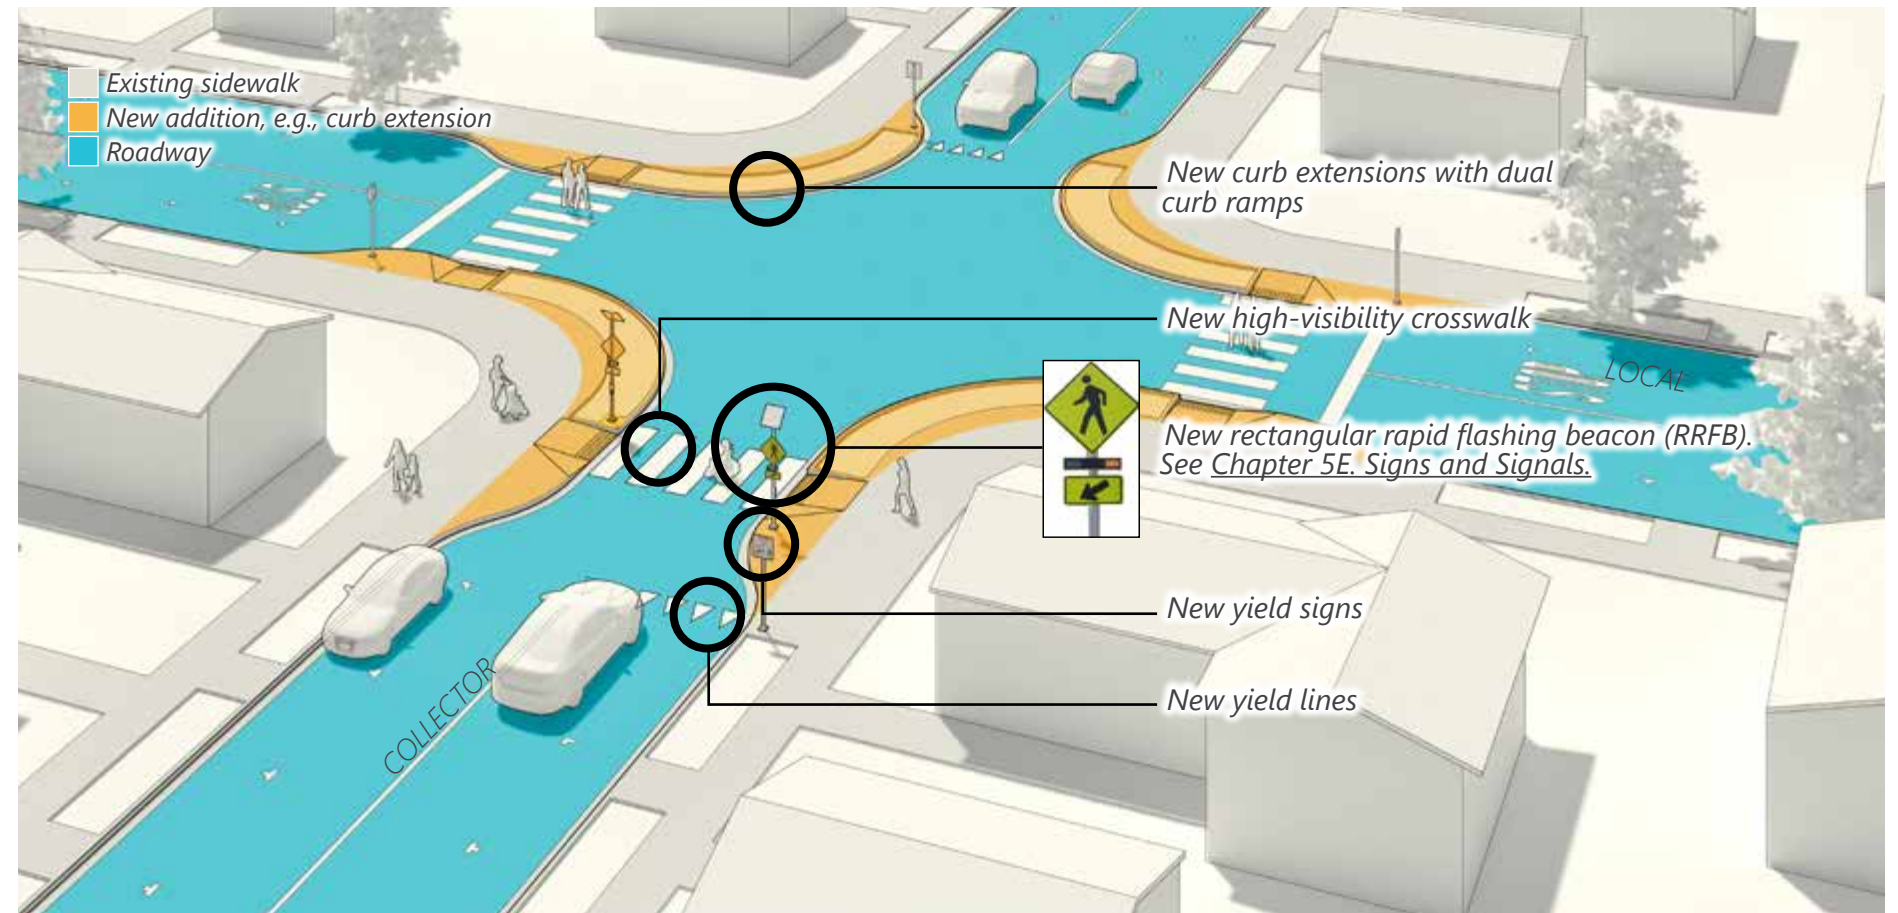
New Marked Crossing and Flashing Beacons at a Two-Way Stop-Controlled Collector/Local Intersection.
